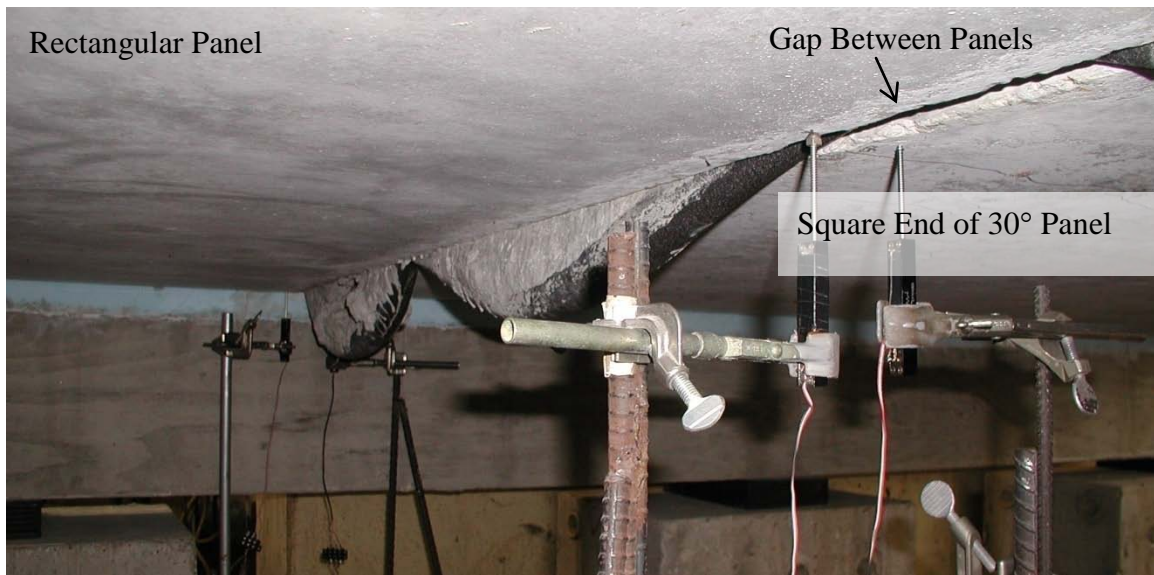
Concrete Flow-Through on Bottom Surface of Specimen P30P3
